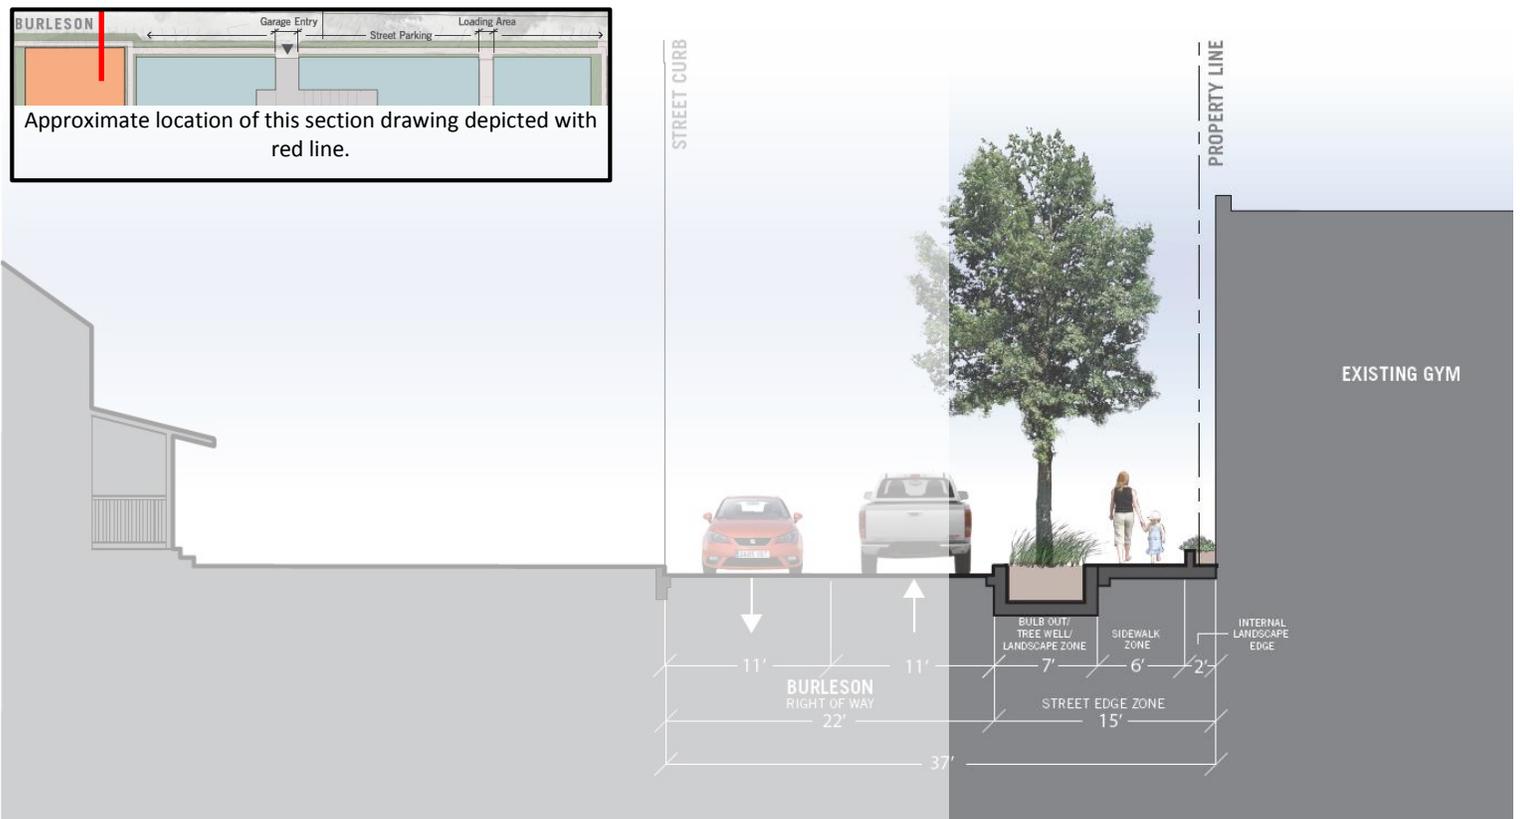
Burleson Street streetscape design concept adjacent to existing gymnasium building.
